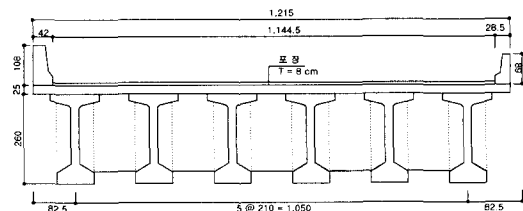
The transverse section of proposed PSC I girder bridge(50m Span)
